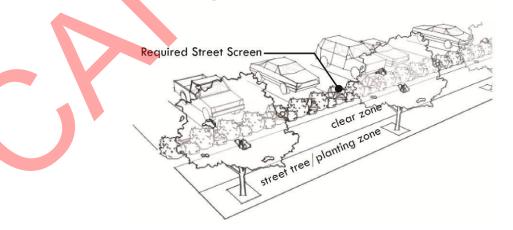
Illustration showing required Street Screen along all frontages with surface parking in the setback zone.
